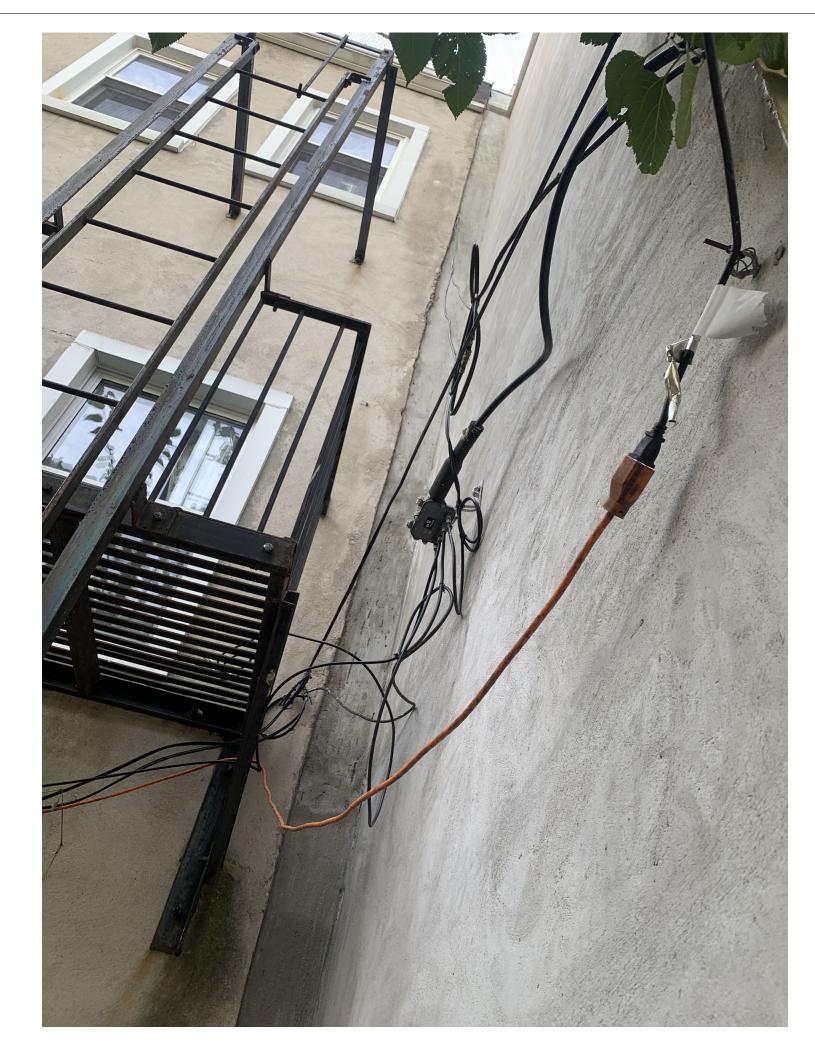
PHOTO LOOKING TOWARDS BAINBRIDGE AS-BUILT CONDITION
